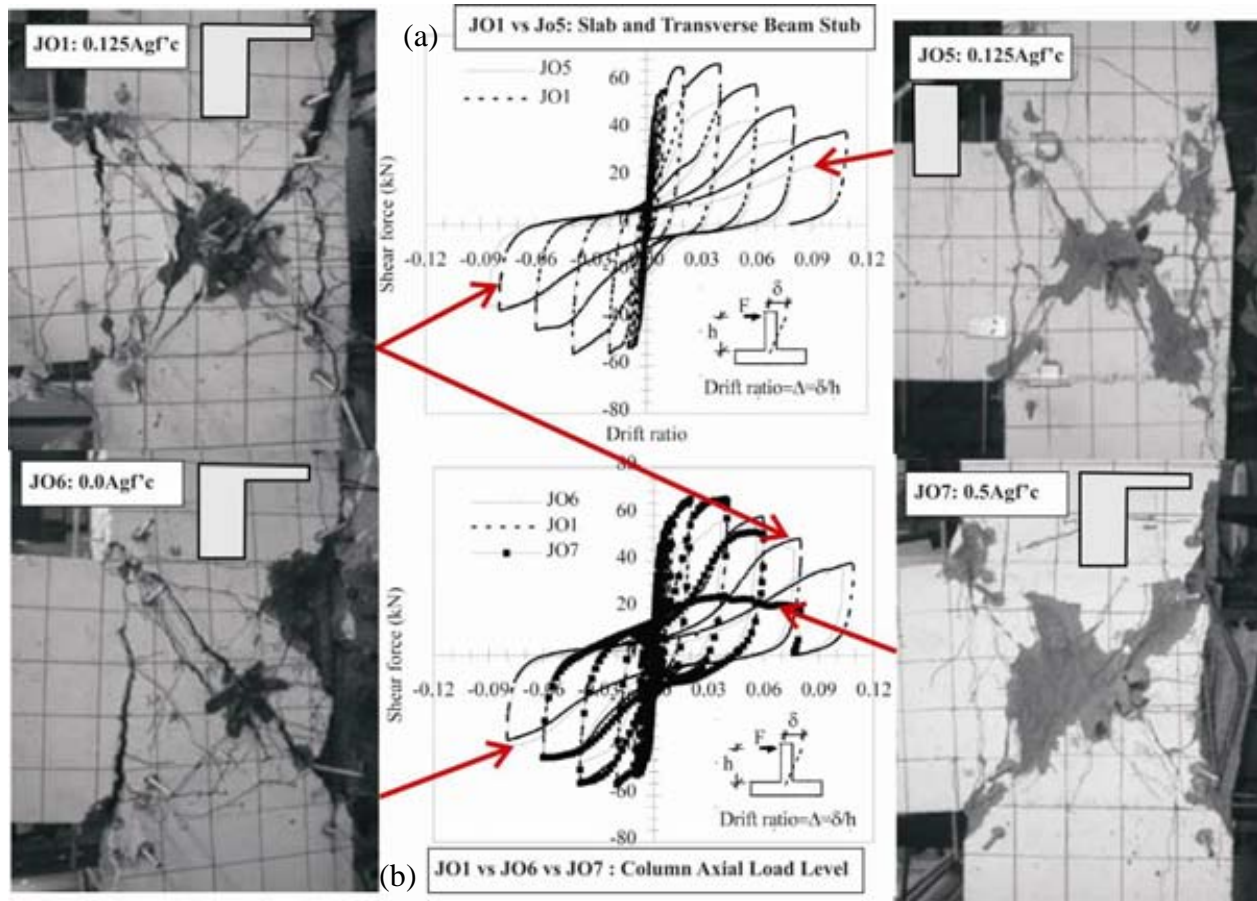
Experimental results of beam-column joints with plain reinforcement considering: a) Presence of slab-transverse beam b) Varying levels of column axial load (adopted from [22]).
